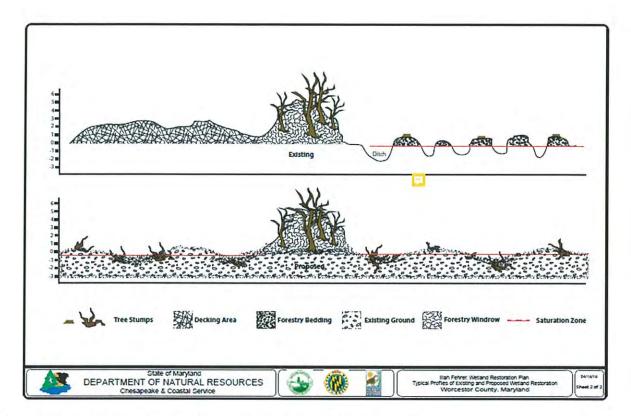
Cross sectional detail of decking areas, forestry bedding and windrows.
